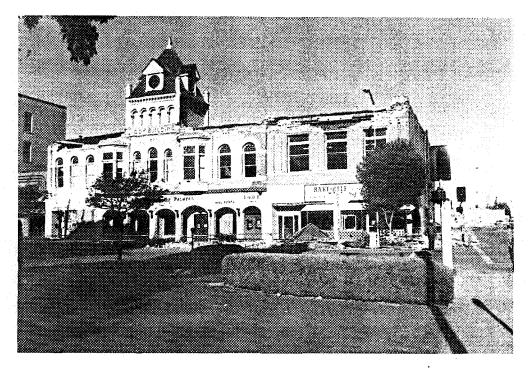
Damage to an old unreinforced building structure - I.O.O.F. Building Built in 1893 on East Beach Street in Watsonville
